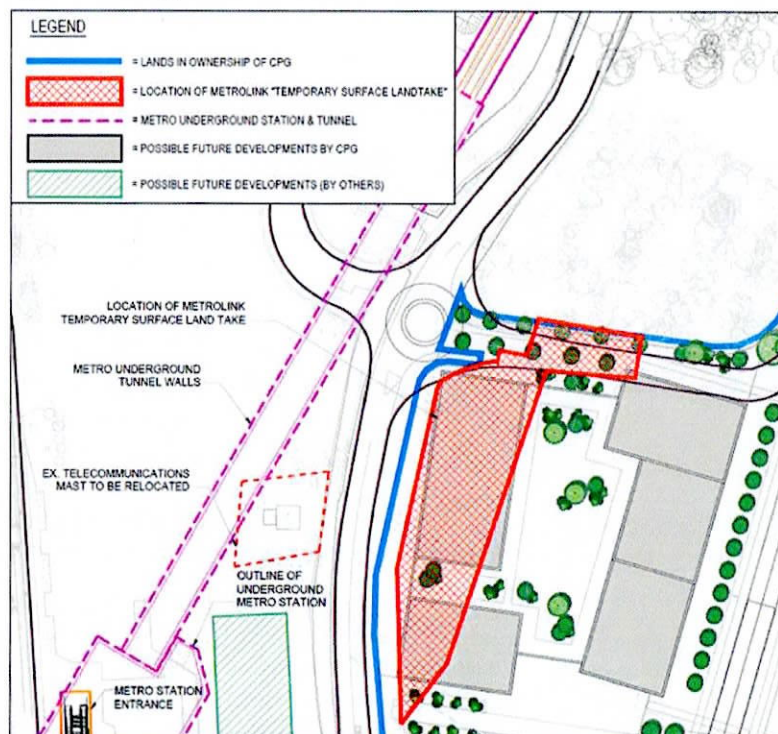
Overlay of proposed Metrolink Temporary Landtake on proposed Masterplan layout for the subject site
